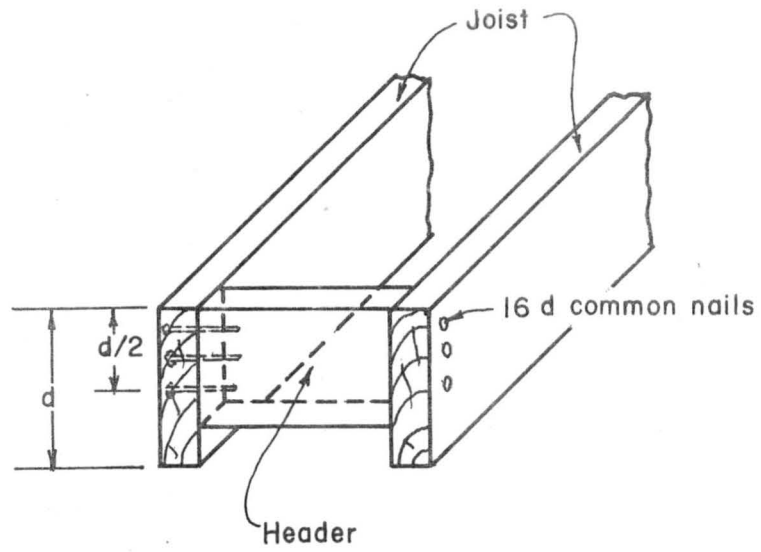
ATTACHMENT OF HEADER FOR T-BEAM CONSTRUCTION
